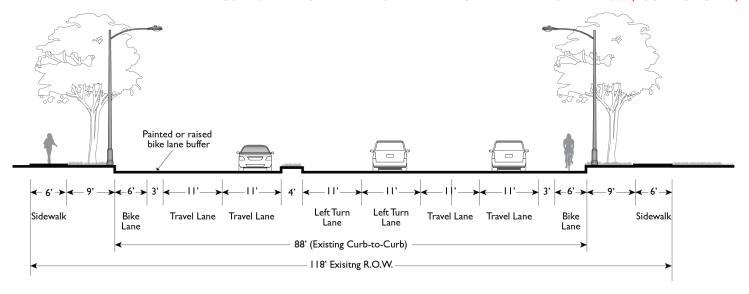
ISABEL AVENUE BETWEEN GATEWAY AVENUE AND I-580 (LOOKING NORTH)
